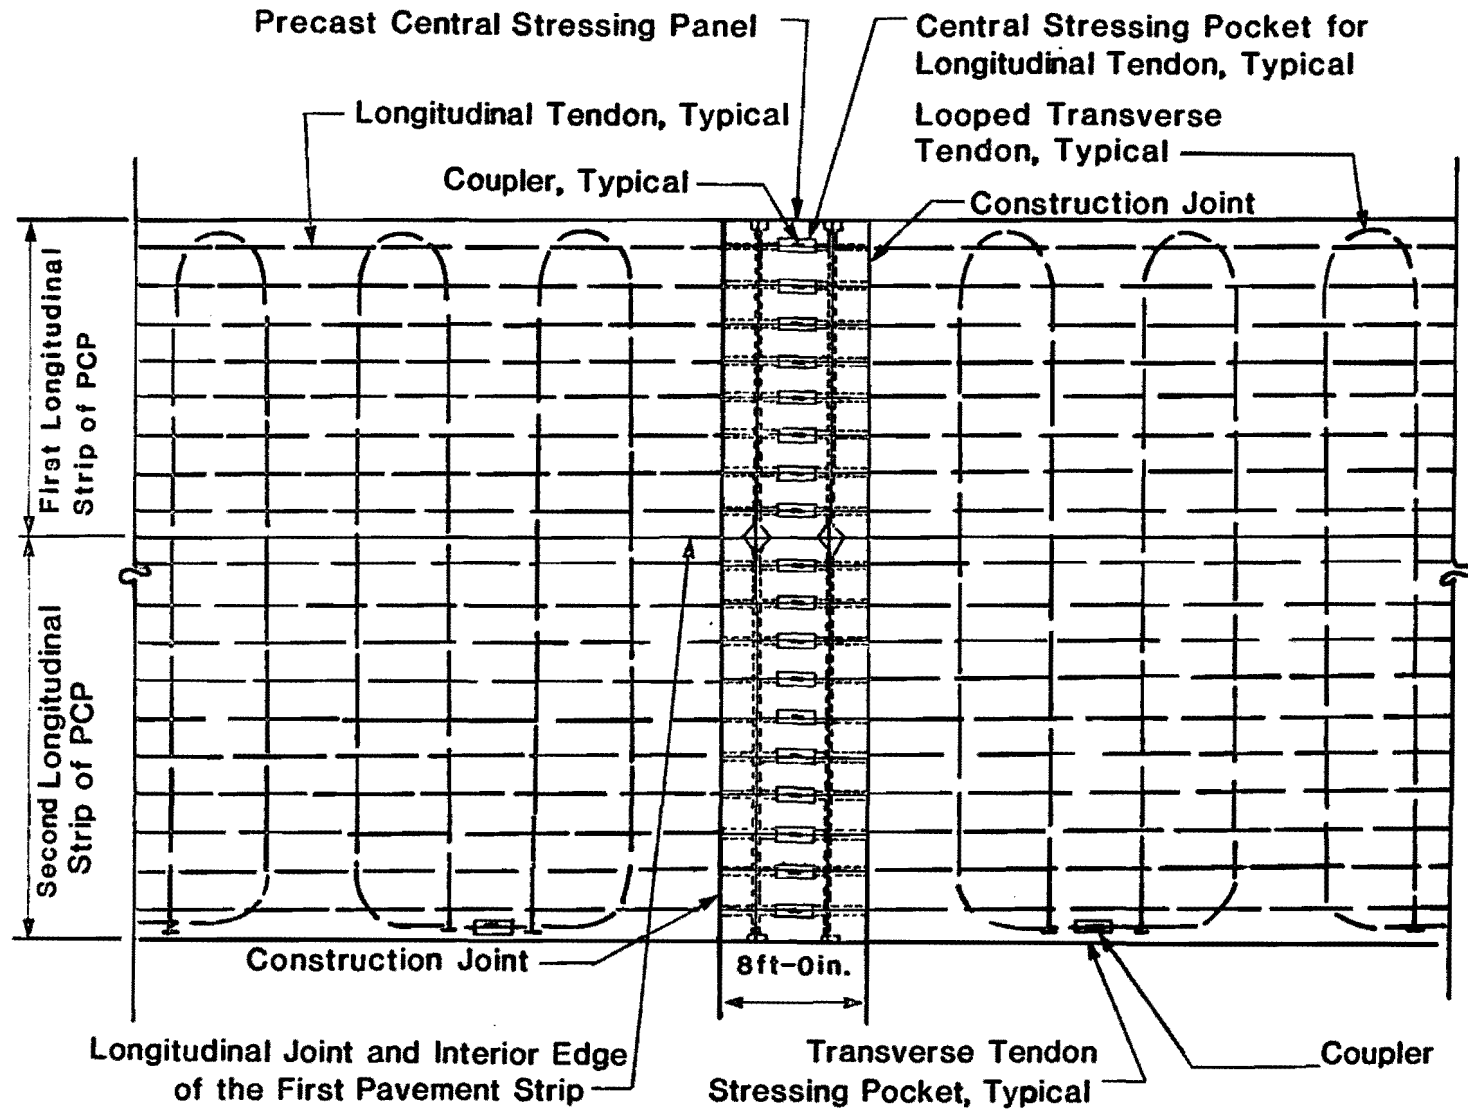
Precast joint panels, central stressing panels, and slip-formed pavement.
